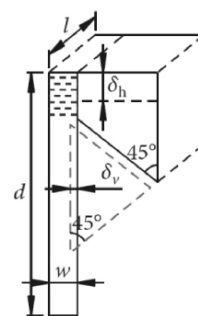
Aas (1976) Assumed Failure Condition in Trench
